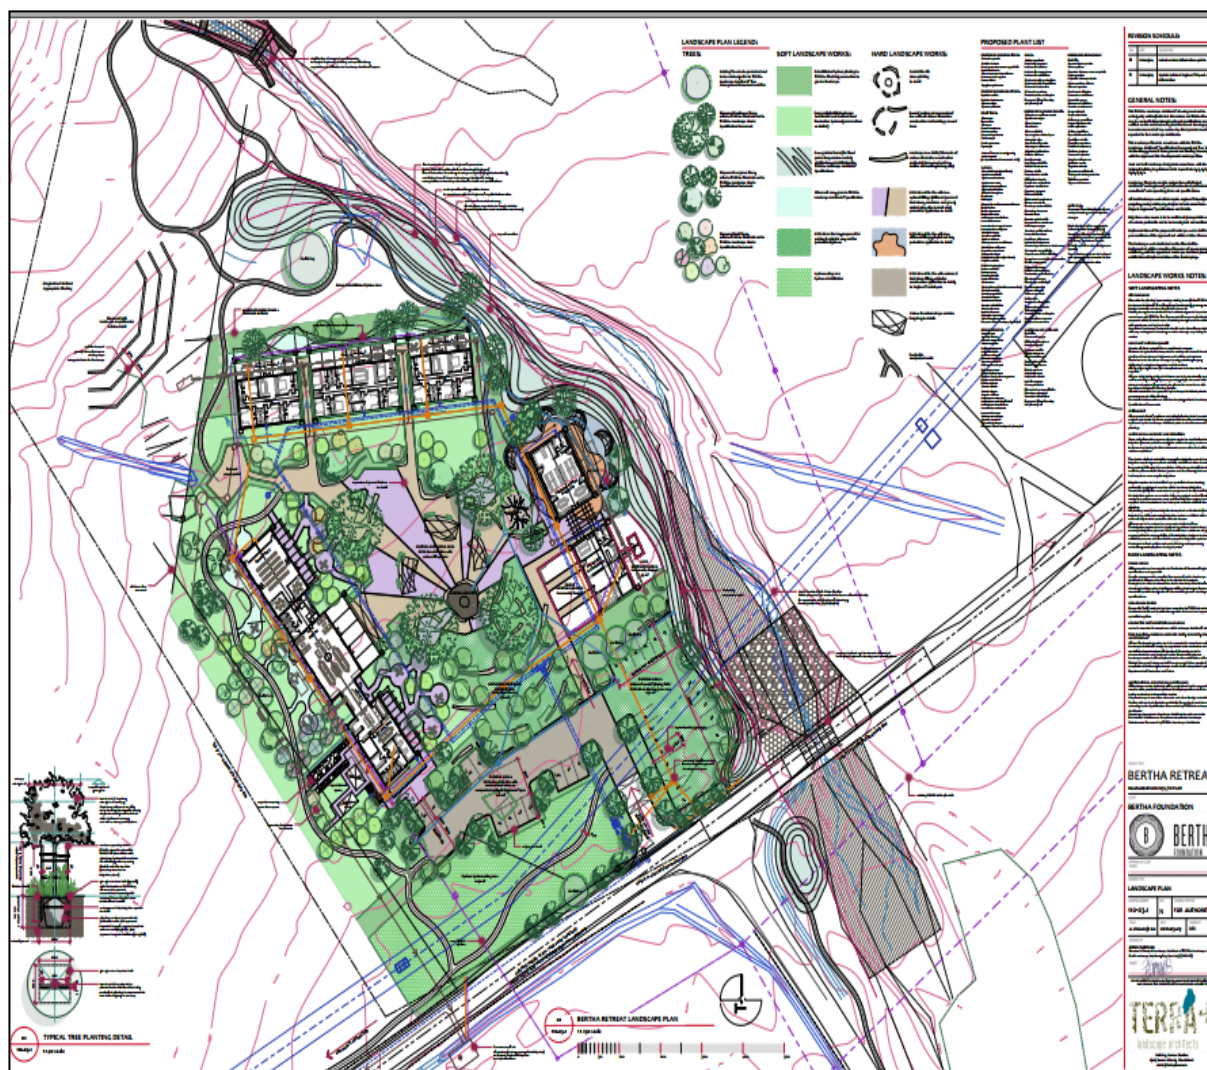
Landscape Plan (source: Terra+, 29 March 2021)
